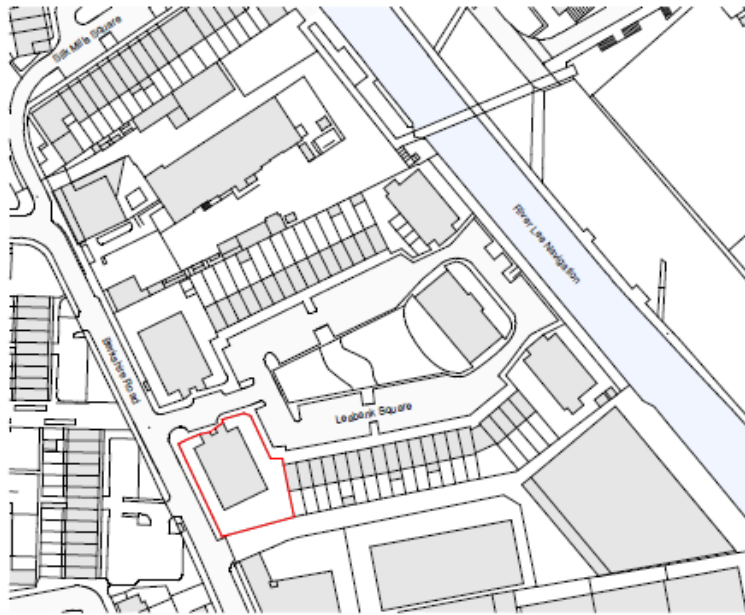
Site Location Plan (outlined in red) from application reference 21/00328/PRNSDB
